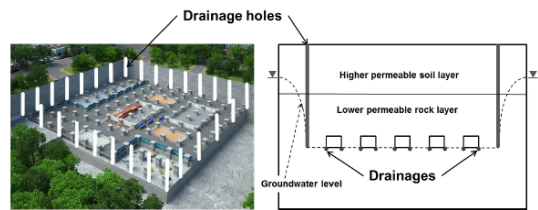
Drainage system using drainage holes at the outside of underground structure (KICT, 2013)
